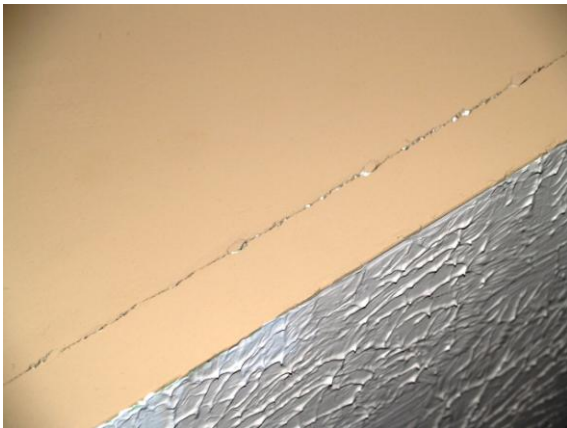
Jagged crack at ceiling of second-floor dormer, showing lateral offsets.
